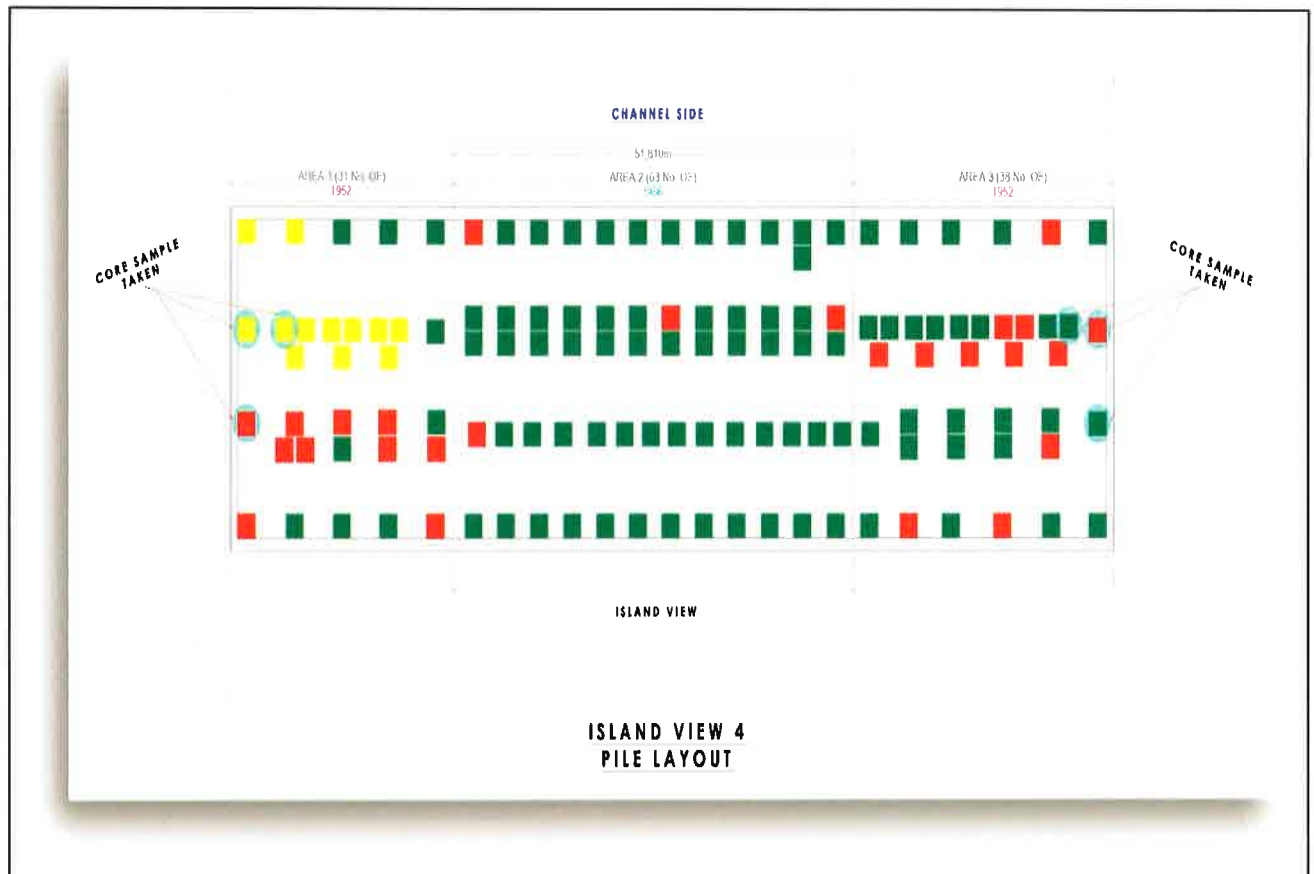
Plan view showing old and new portions of the berth as well as the precast pile inspected
